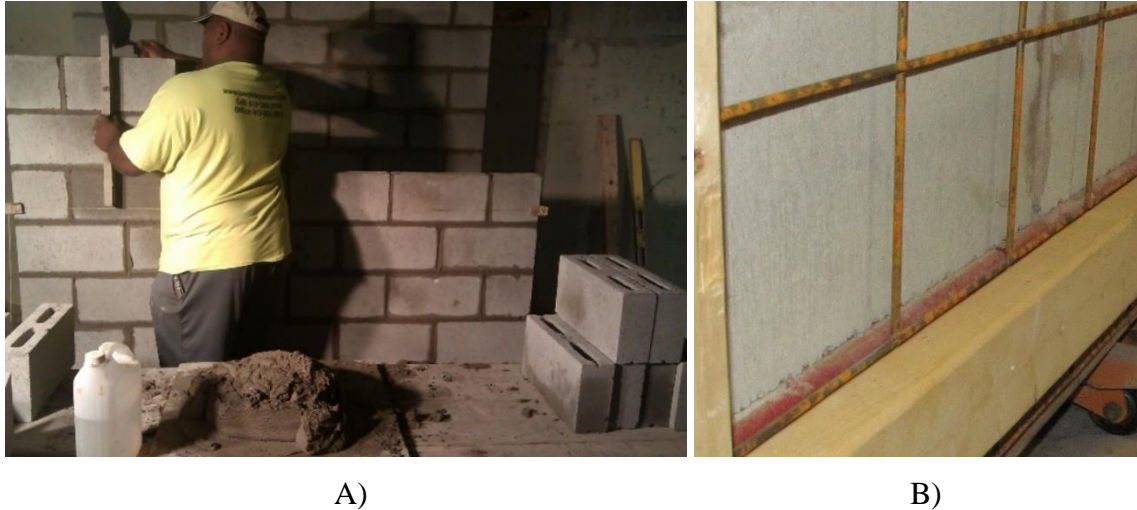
A) Mason laying out the CMU walls. B) 13mm of space between mesh and wall
